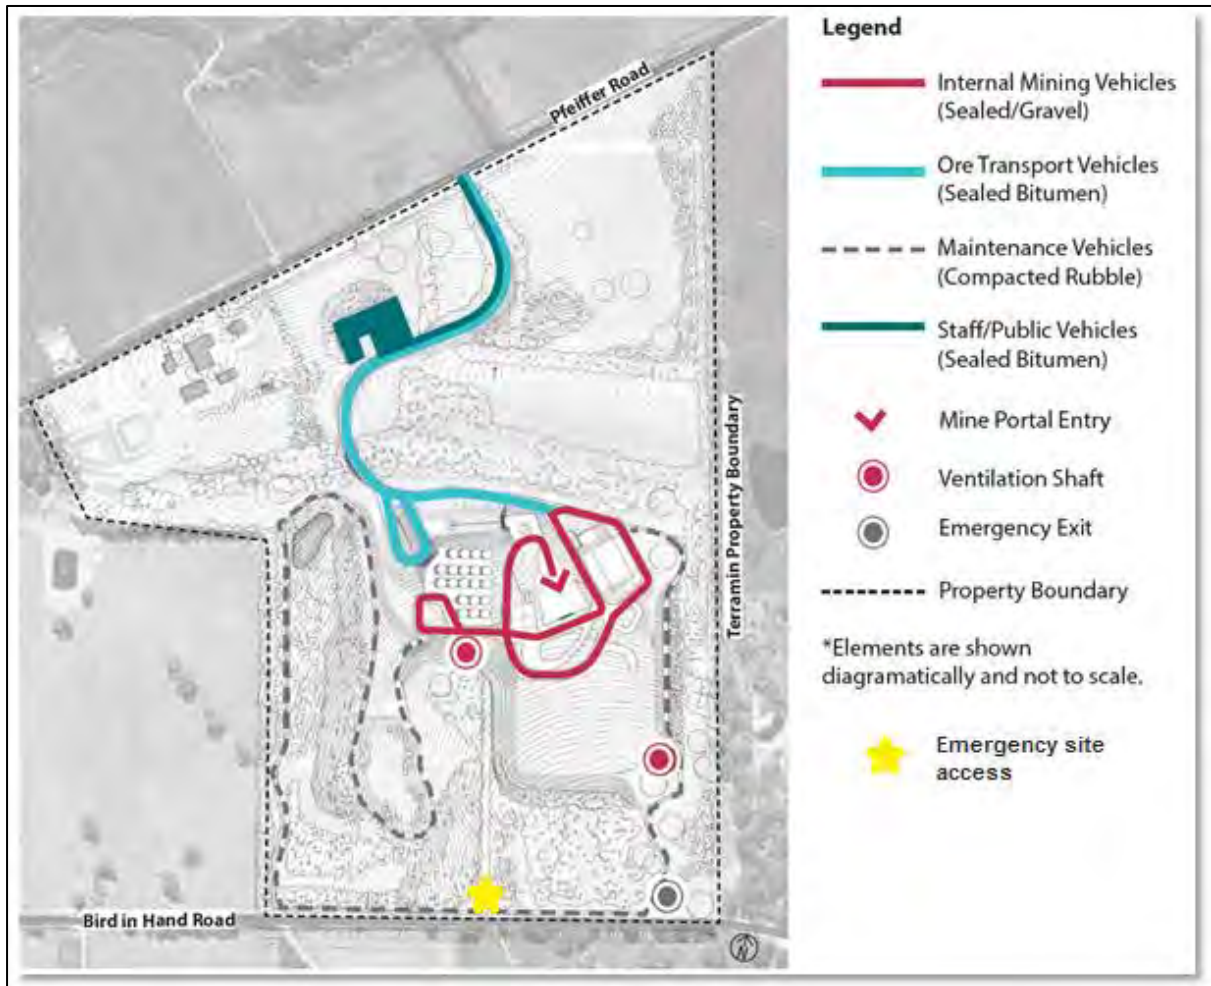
| PROPOSED INTERNAL ROAD TYPES AND ACCESS POINTS FOR THE BIH SITE (APPENDIX G1)
